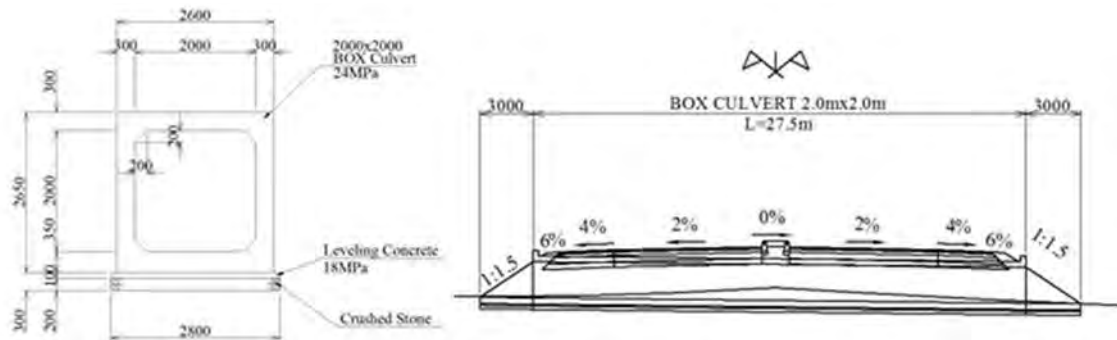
Position of Box Culvert (Starting Point side: Dam Nha Mac Area/Earth Works in
